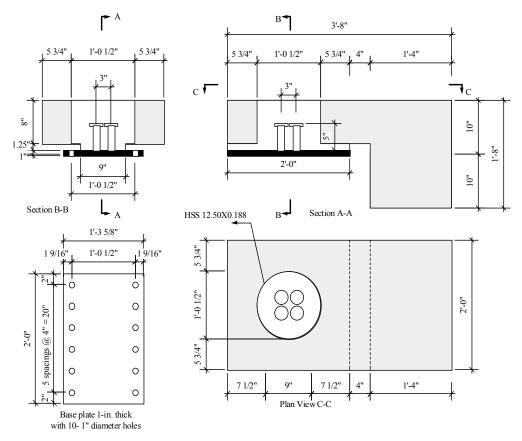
Concrete Dimensions of the four-stud, steel-tube confinement specimen PCI/National Bridge Conference 2006
